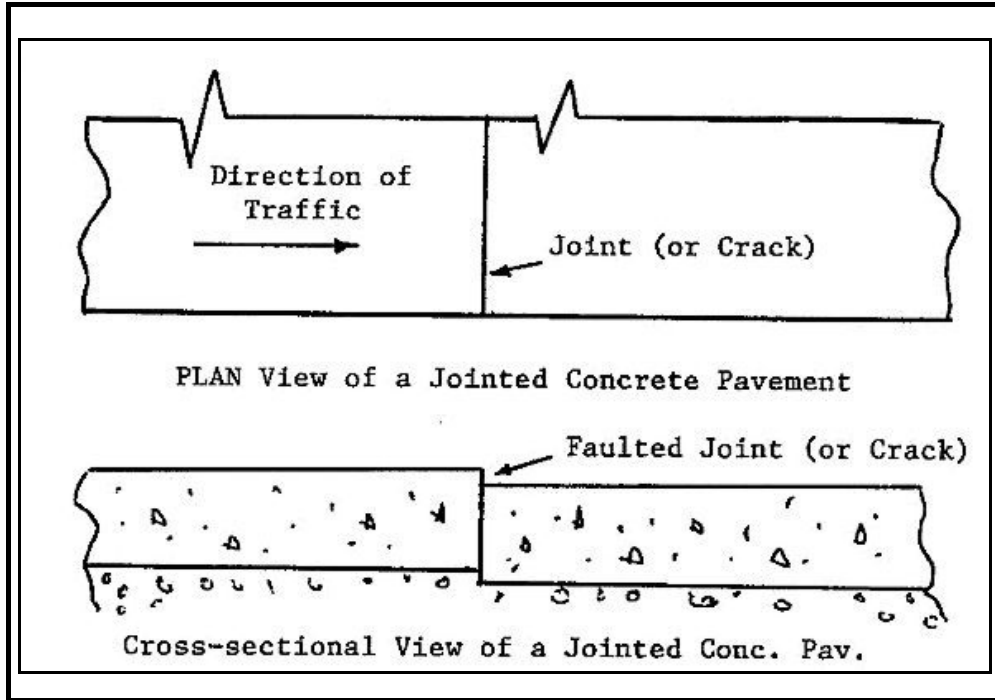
Sketch showing Faulting in Jointed Concrete Pavement
